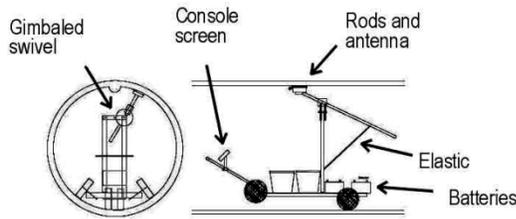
GPR on a push cart used from inside the tunnel (Redrawn from Parkinson and Ekes, 2008)
